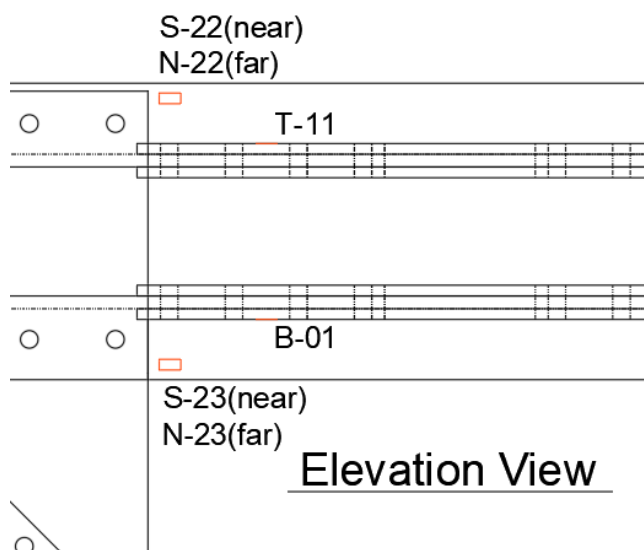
Elevation view of exposed portion of channels showing strain gage labels
